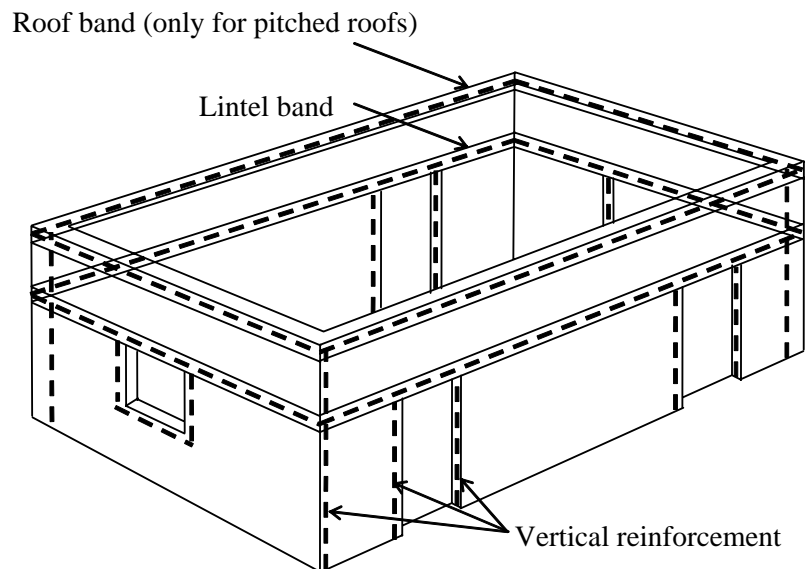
Horizontal bands and vertical reinforcement for a non-engineered masonry building
